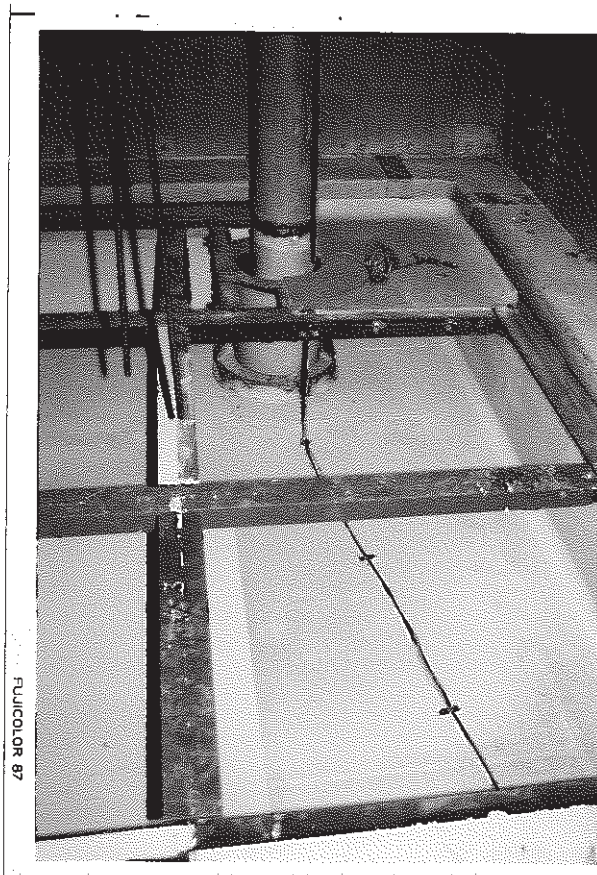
Arrangement of Drain Pipe and Smothering Tank
